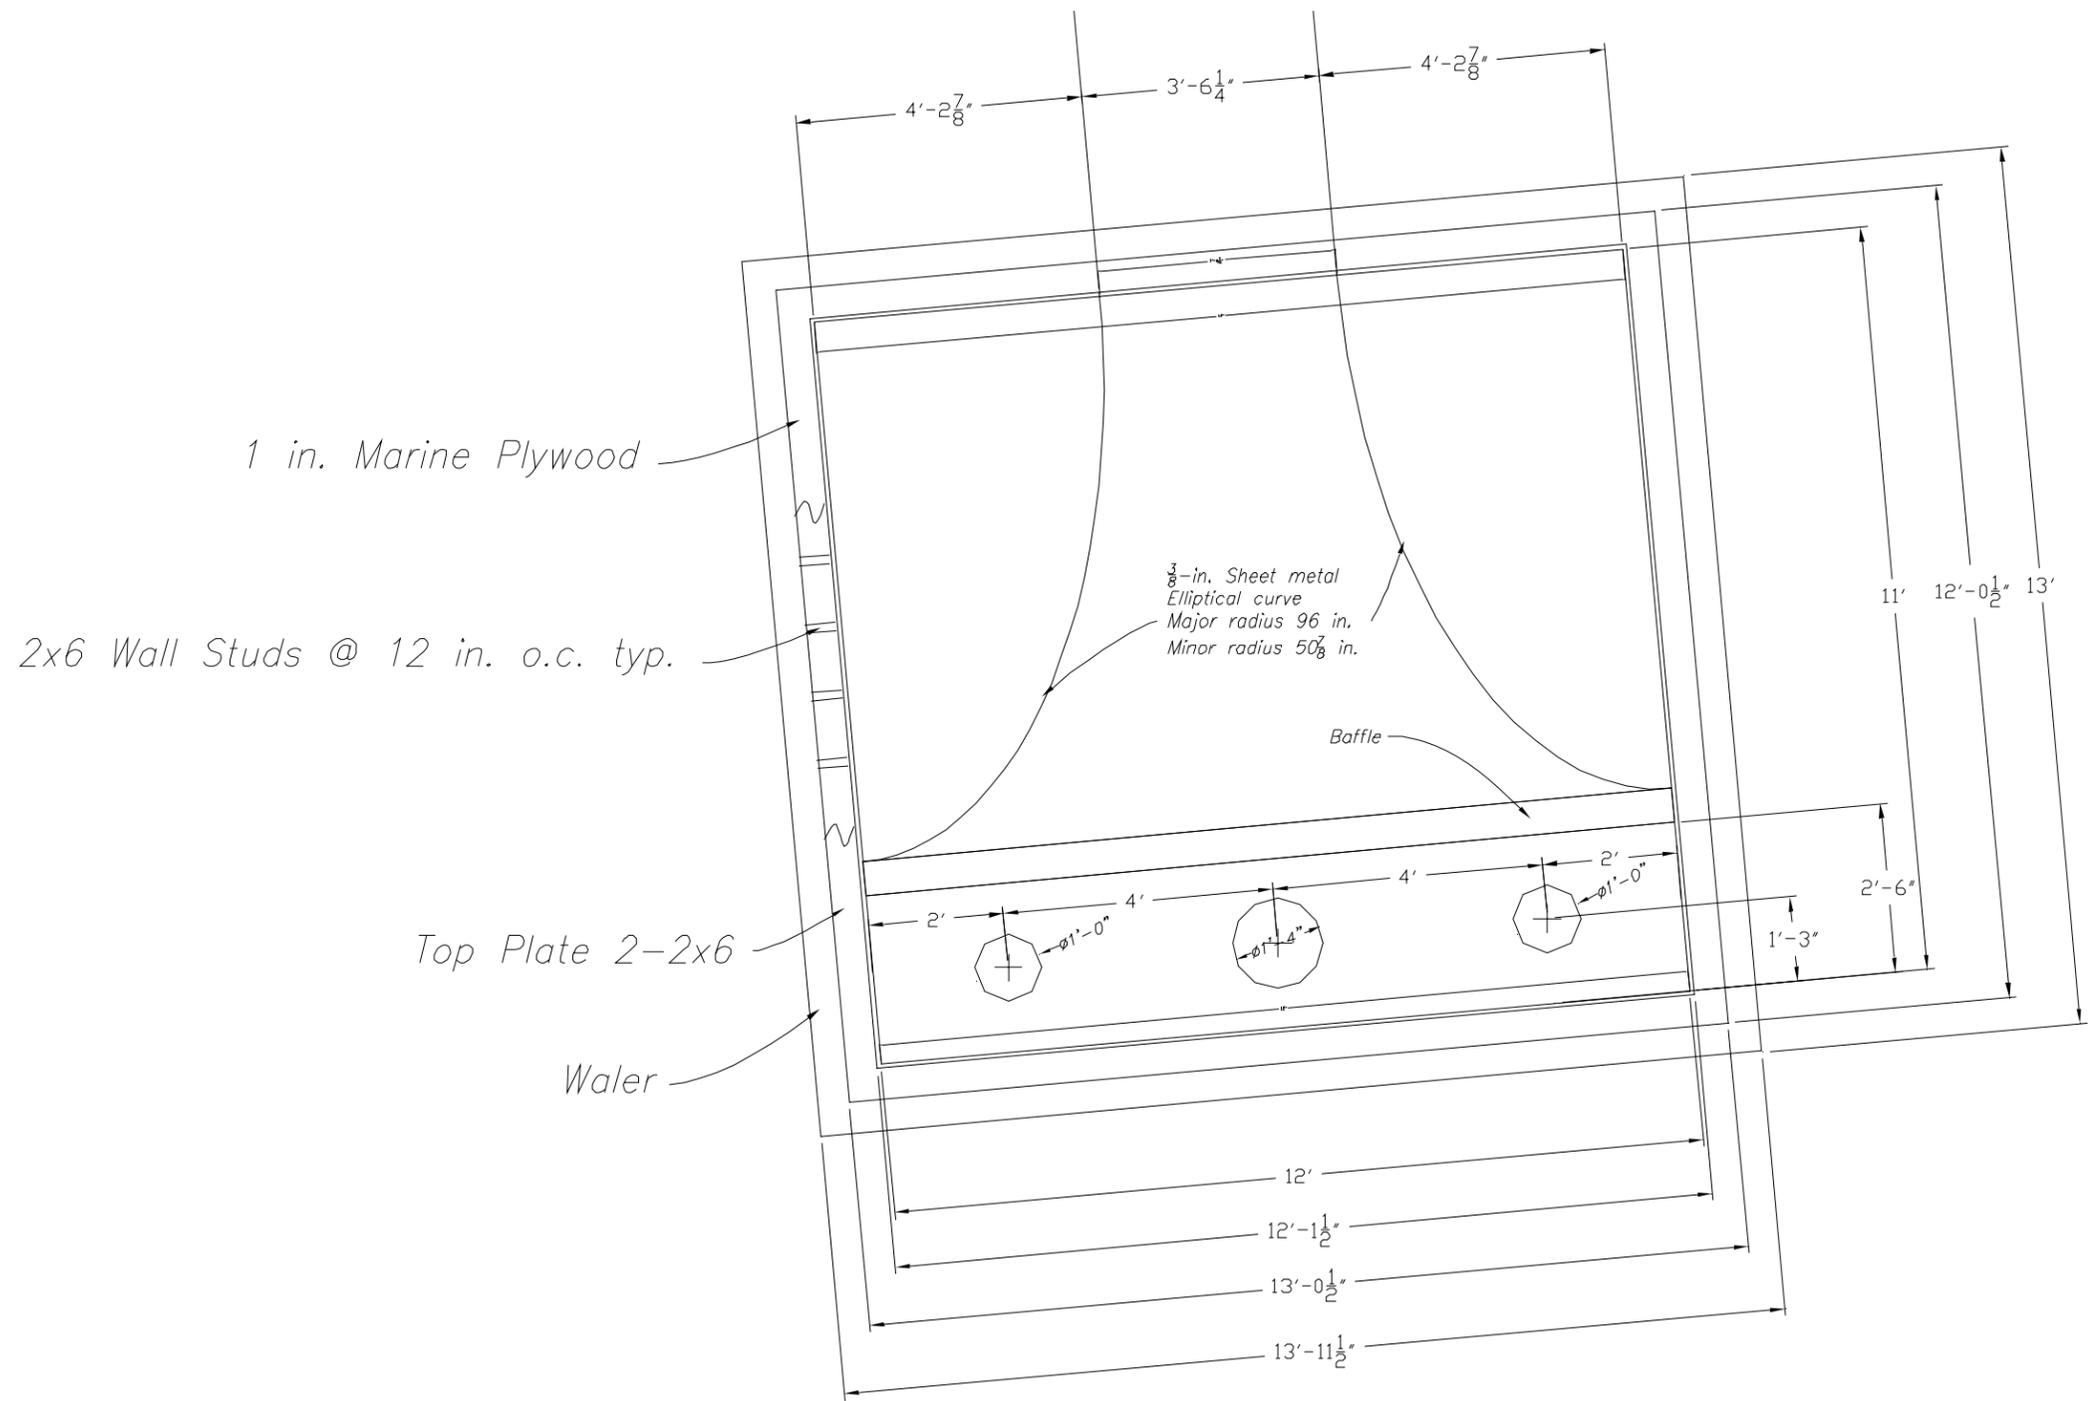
Model construction drawing: Plan view of auxiliary spillway headbox with inlet pipes and curved transition walls.
